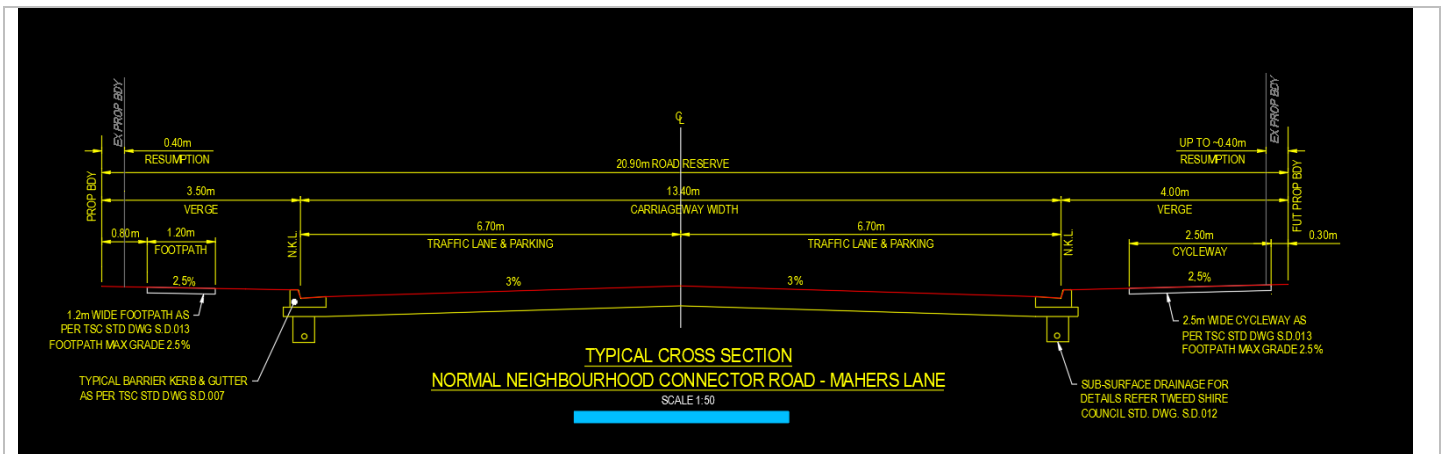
Typical cross section, normal neighbourhood connector road – Mahers Lane
